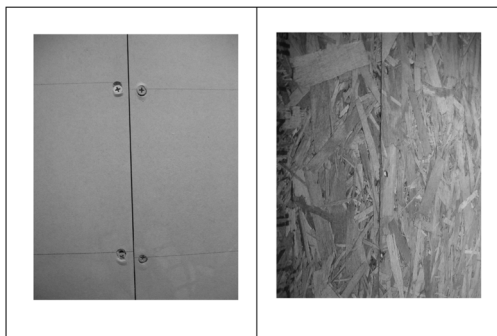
Failure of nailed joints with OSB and gypsum board shear wall (G12.5/OSB).
